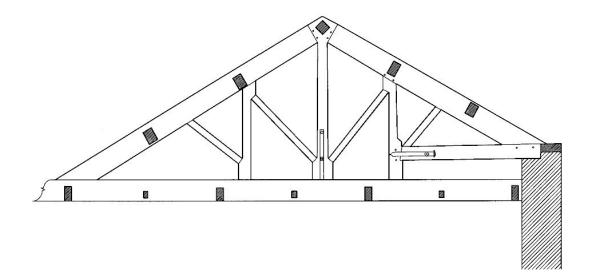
Lytham Hall typical full roof truss, EH survey drawing. This roof truss is typical of T1-T3, T6-T9 and T12-T14, and some of the trusses in T17-T22
